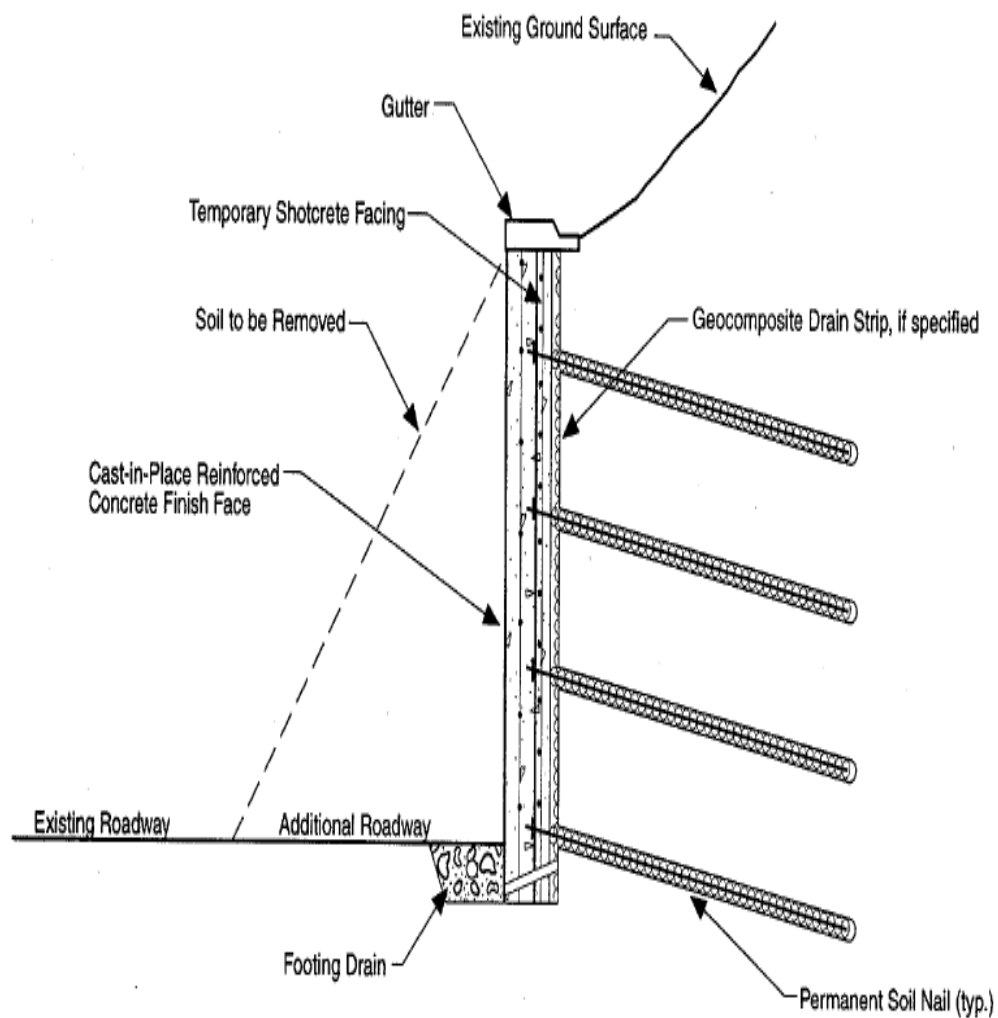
Permanent soil nail wall section (FHWA-SA-96-069R, 1998).
